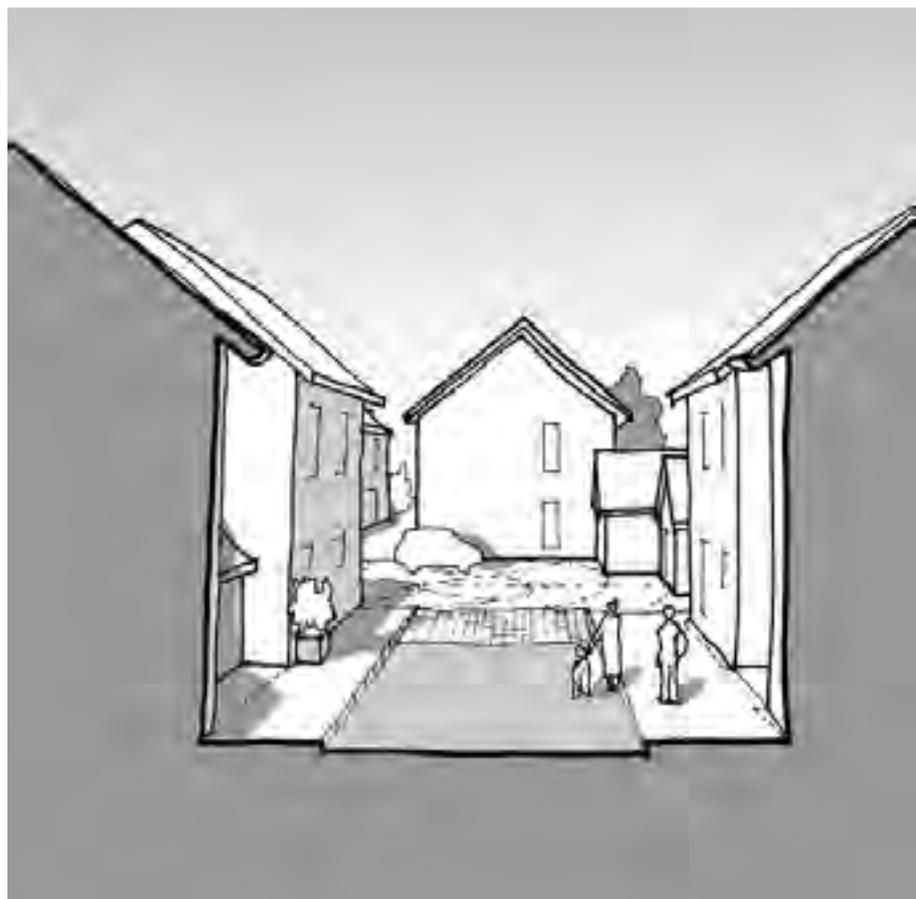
Illustration of Housing Design Principles concept (Your Kirkwall).
